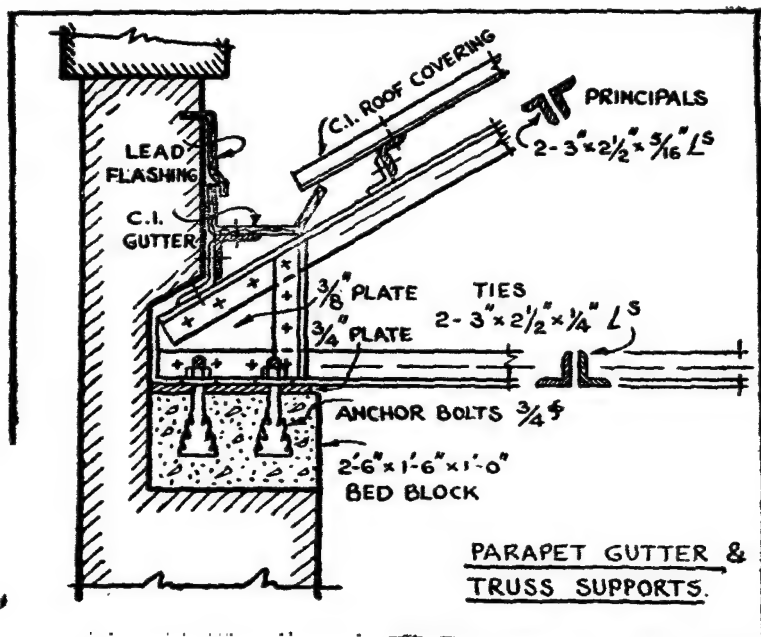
Details of Steel truss and roof with parapet wall and gutter.
